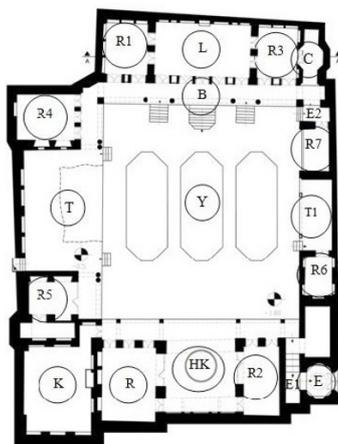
Qoreishi House's Ground-Floor Plan (Farokhyar, 2013, p. 231)
